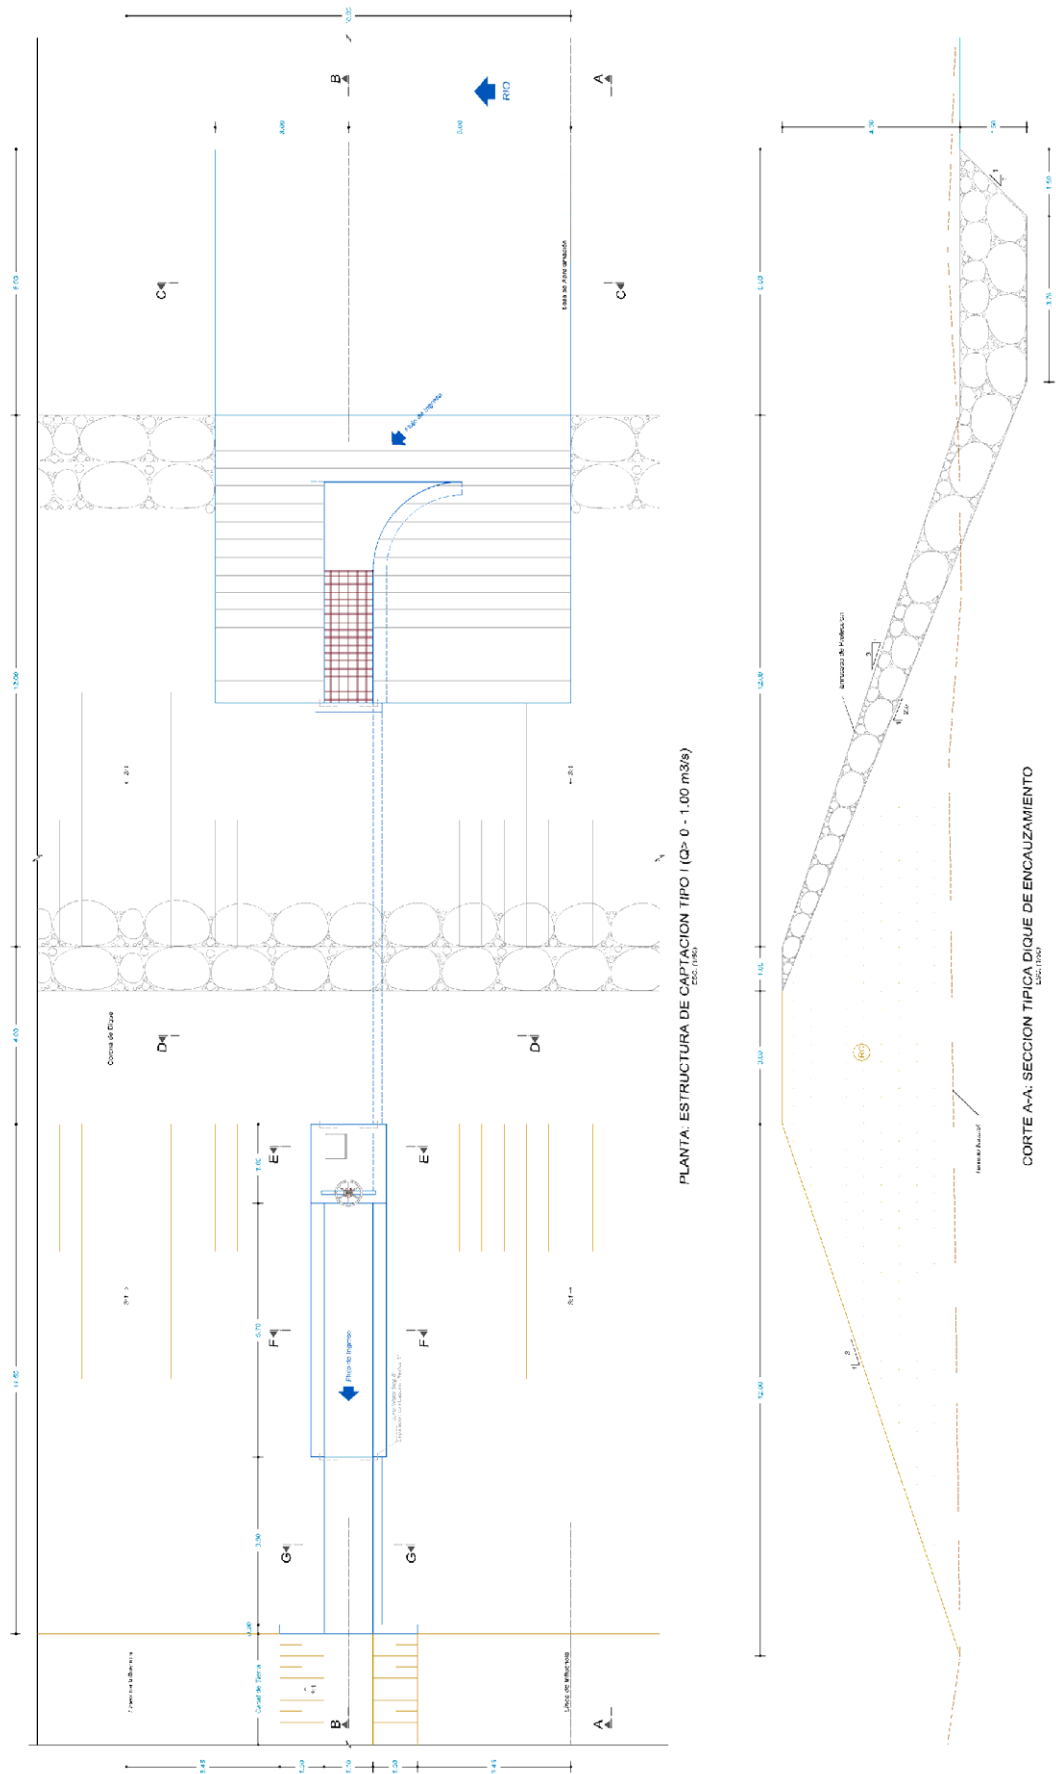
Structure Drawing of Intake Facility Type I (1/2)
